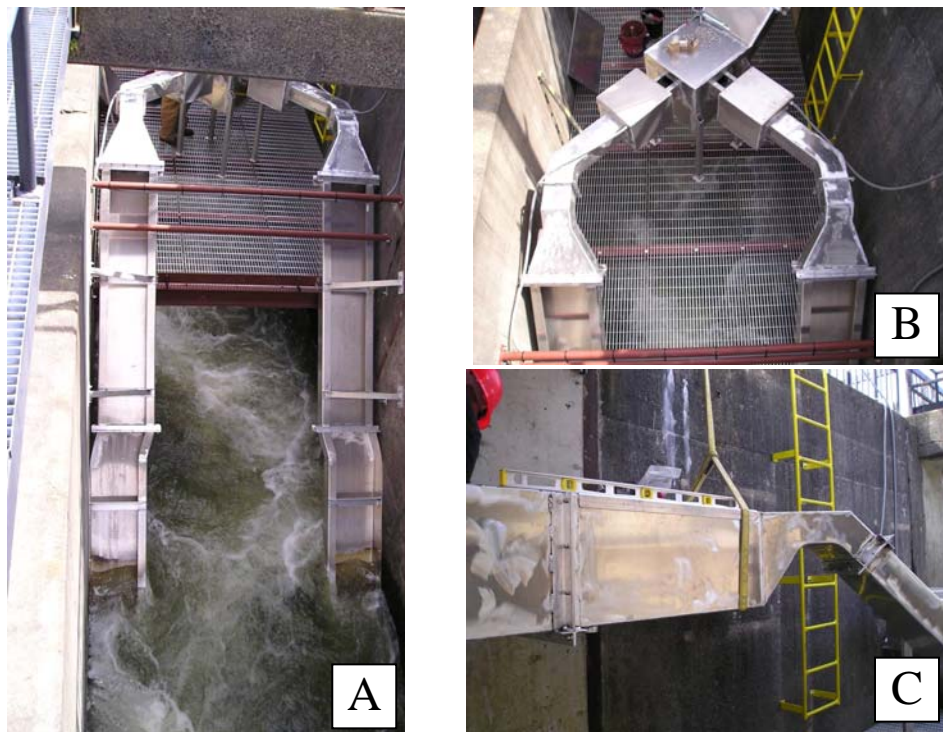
Photos of LPS installation in the Bradford Island AWS channel: A) dual collection ramps, B) access platform, and C) short ramp leading into large rest box.
